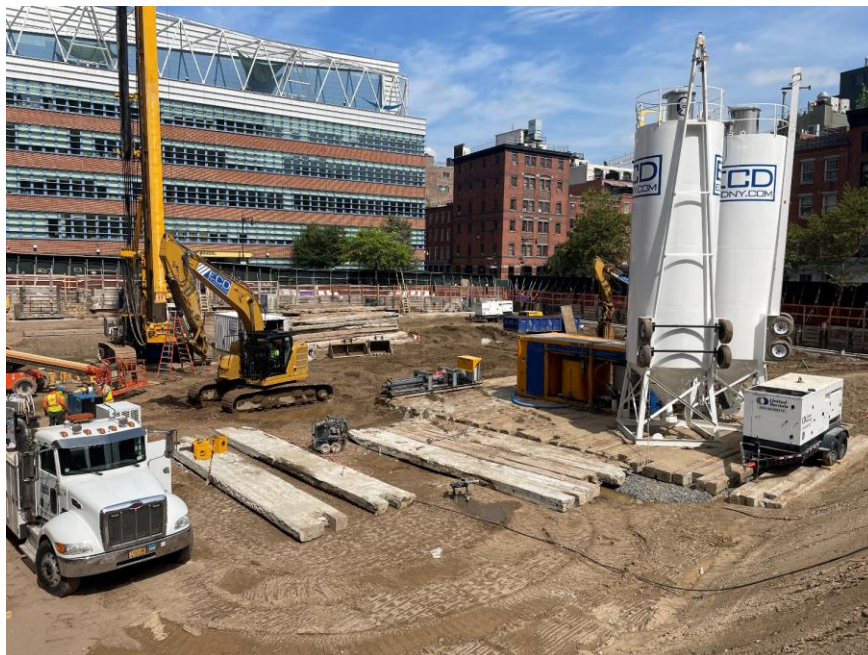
ECD assembling the Bauer BG45 drill rig in the eastern part of the site (facing southeast)
